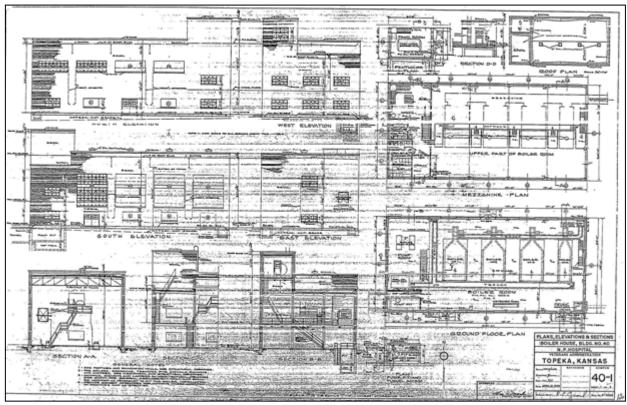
Architectural drawing showing the Boiler House in plan, section, and elevation, 1955 (VA).
